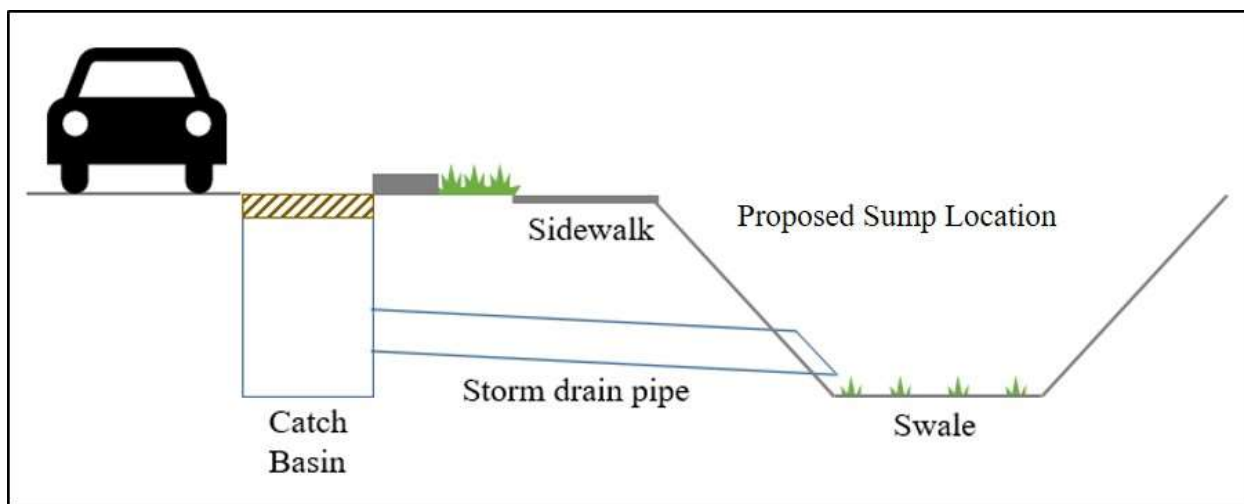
Typical Cross Section of Stormwater System in the Study Area
